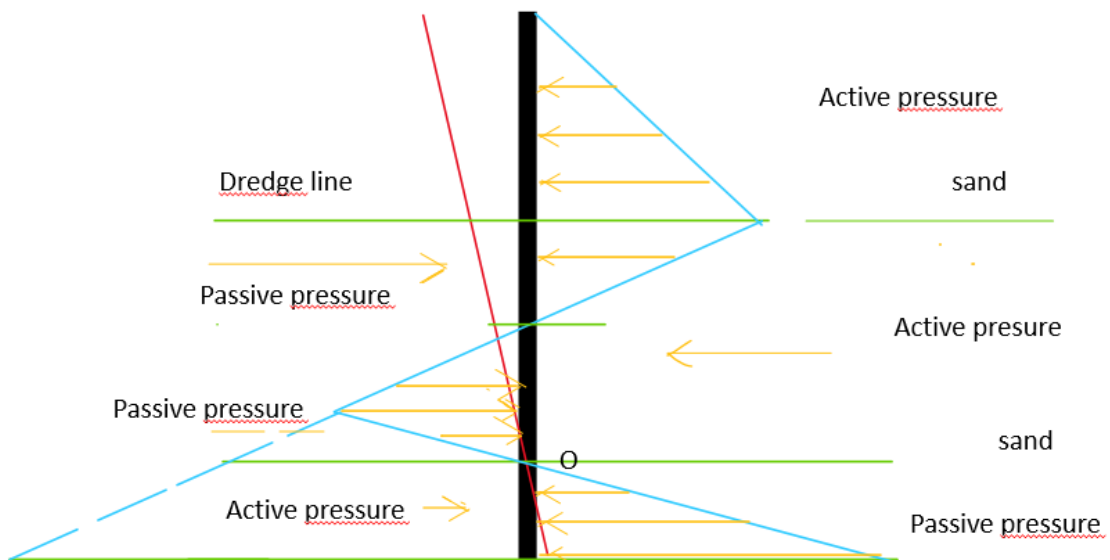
cantilever sheet pile wall pressure distribution penetrating a sandy soil without ground water level. Illustrated by Yonas Tsighe.
